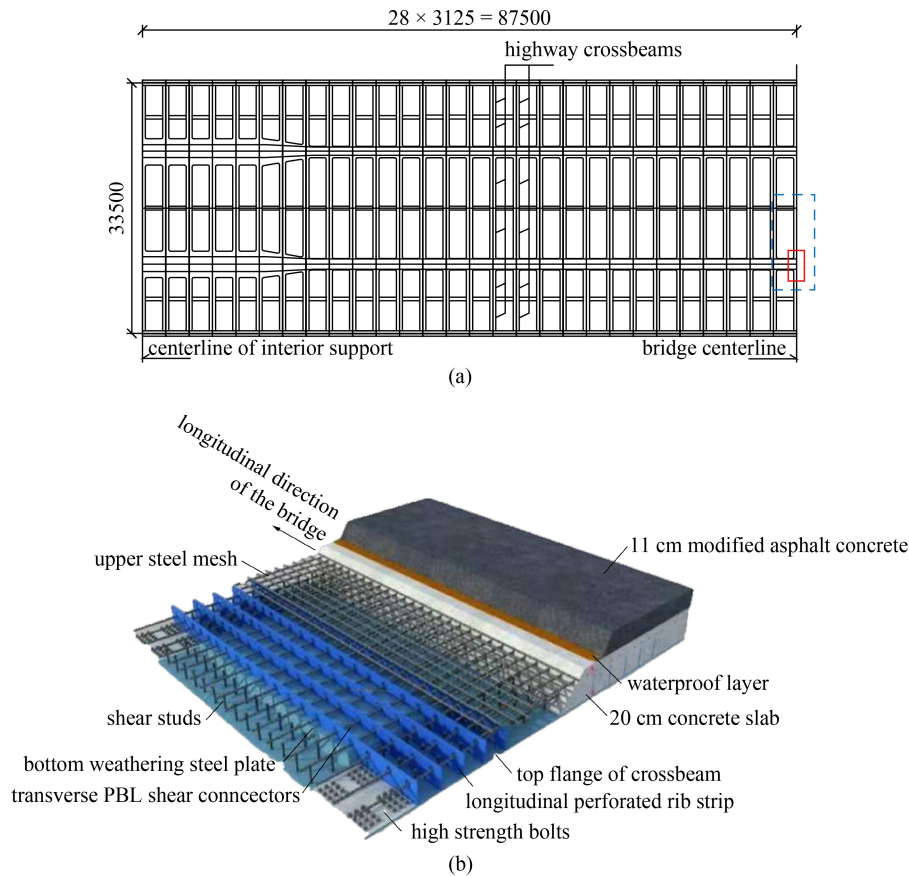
Highway deck of the Nansha Port Bridge: (a) supporting beam layout of the deck (mm), showing half of the central span with crossbeams and stringers; (b) structural diagram of the composite deck, showing weathering steel plate, perforated rib strips, shear studs, and reinforcement.
